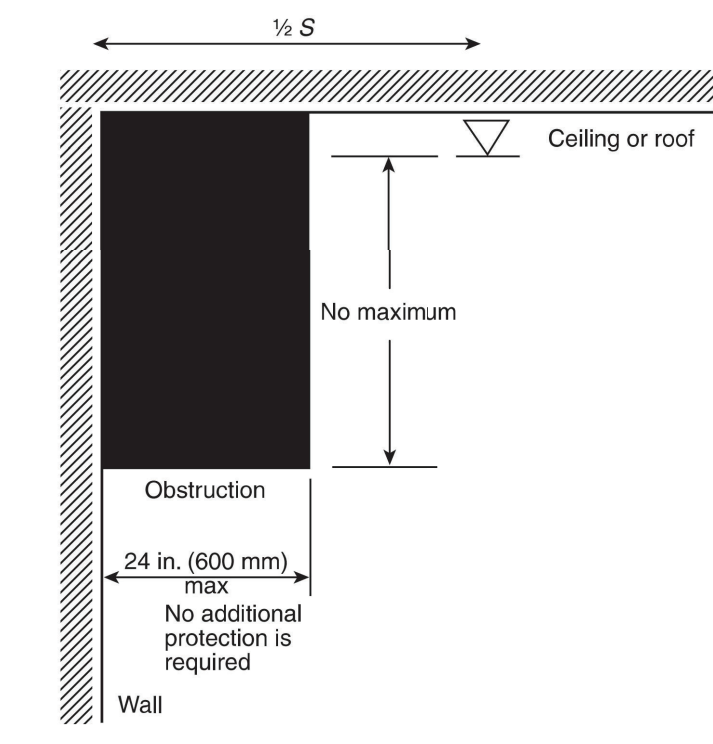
(c) Obstructions Against Walls (SSU/SSP).
